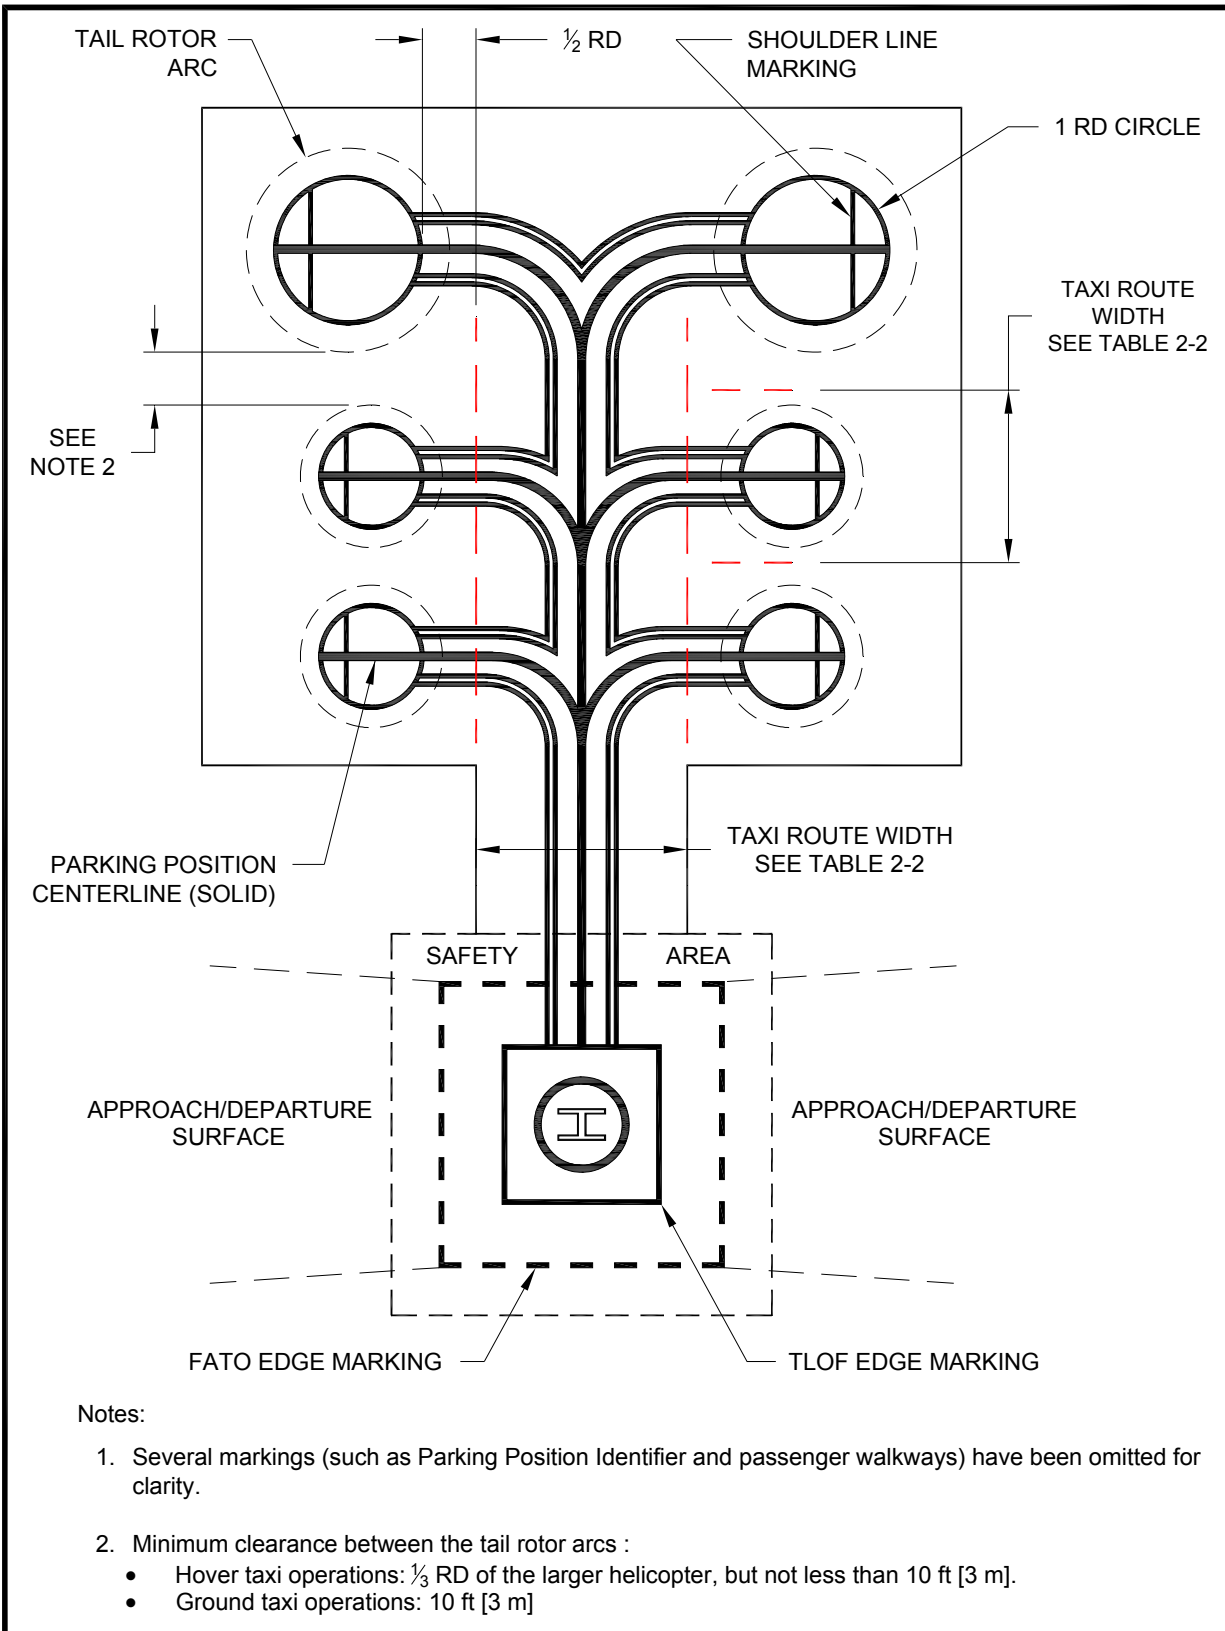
Parking Area Design – “Back-out” Parking Positions: General Aviation
